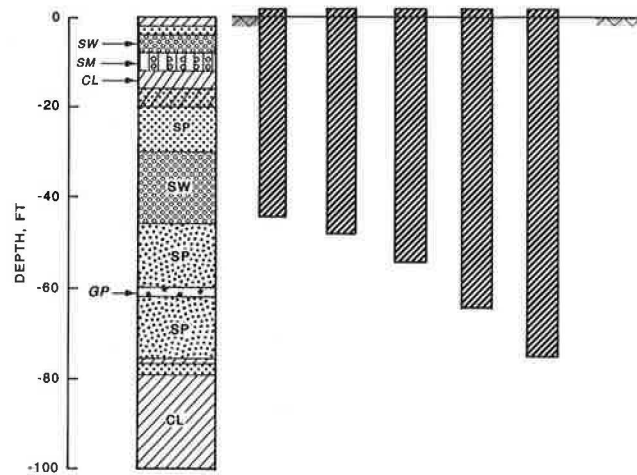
Generalized soil profile at Lock and Dam No. 3 pile test site.
